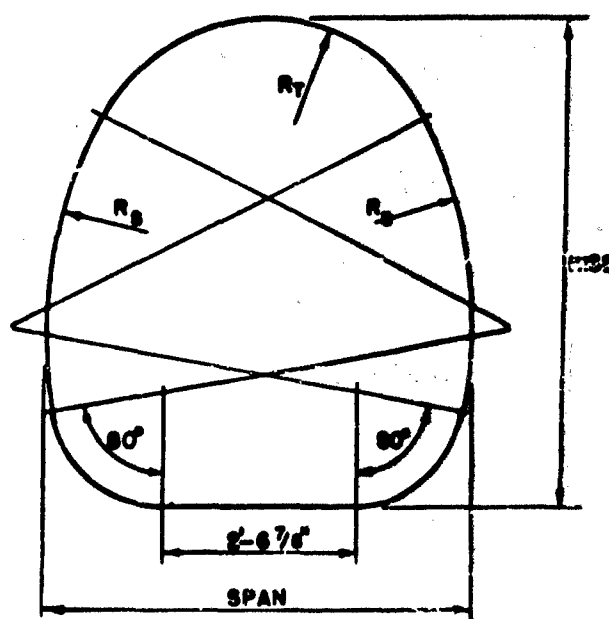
Corrugated steel cattle pass cross section. Table I contains standard dimensions for this section.
